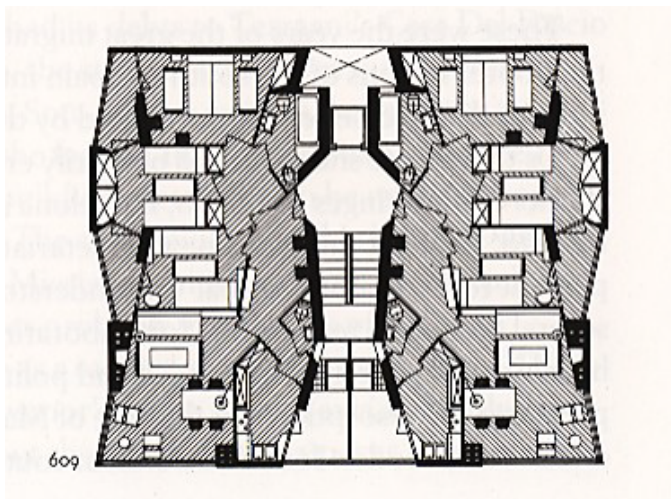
LA BARCELONETTA APARTMENT BUILDING, Barcelona, 1951
